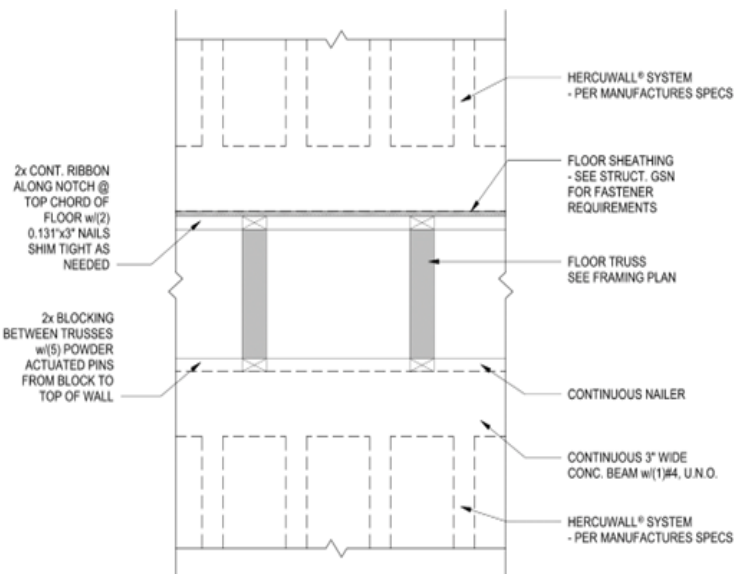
Typical Truss Perpendicular to Wall (Elevation)
